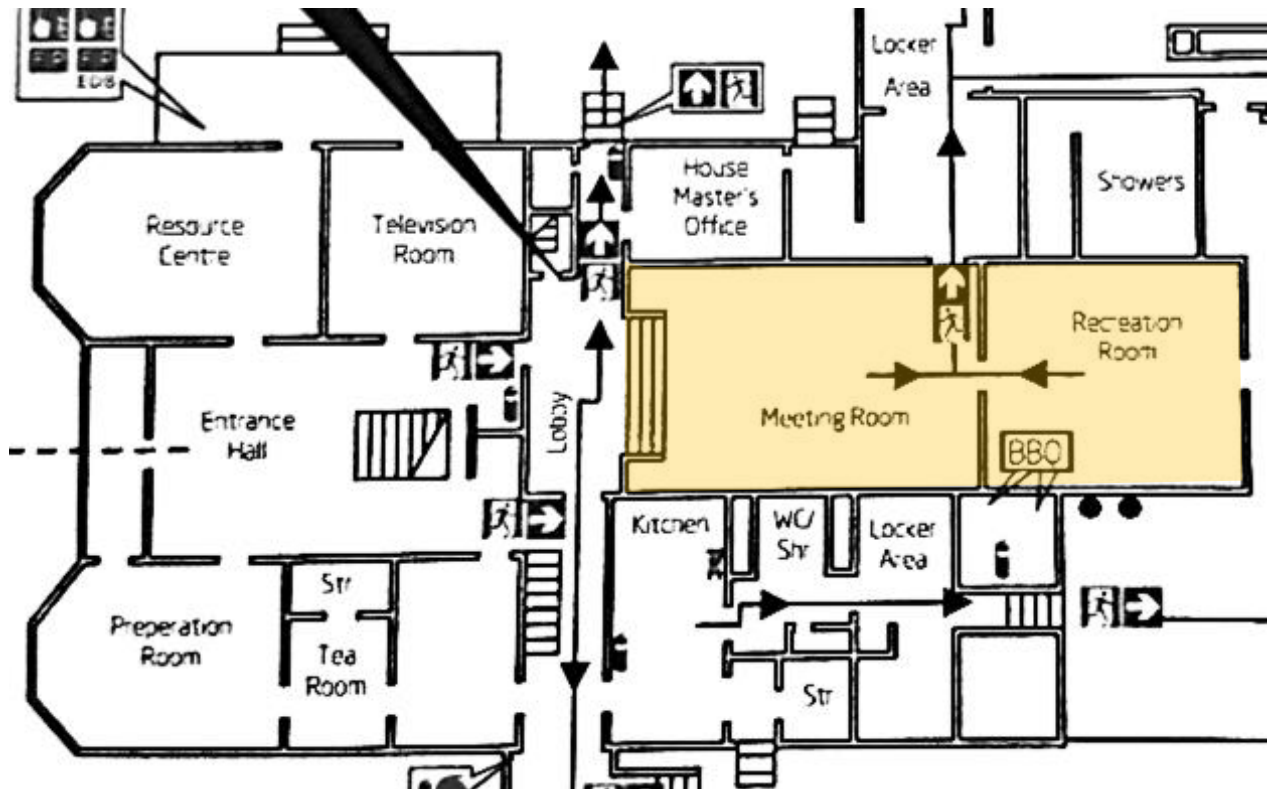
Floor plan of Gowan Brae House with 1904 additions highlighted
